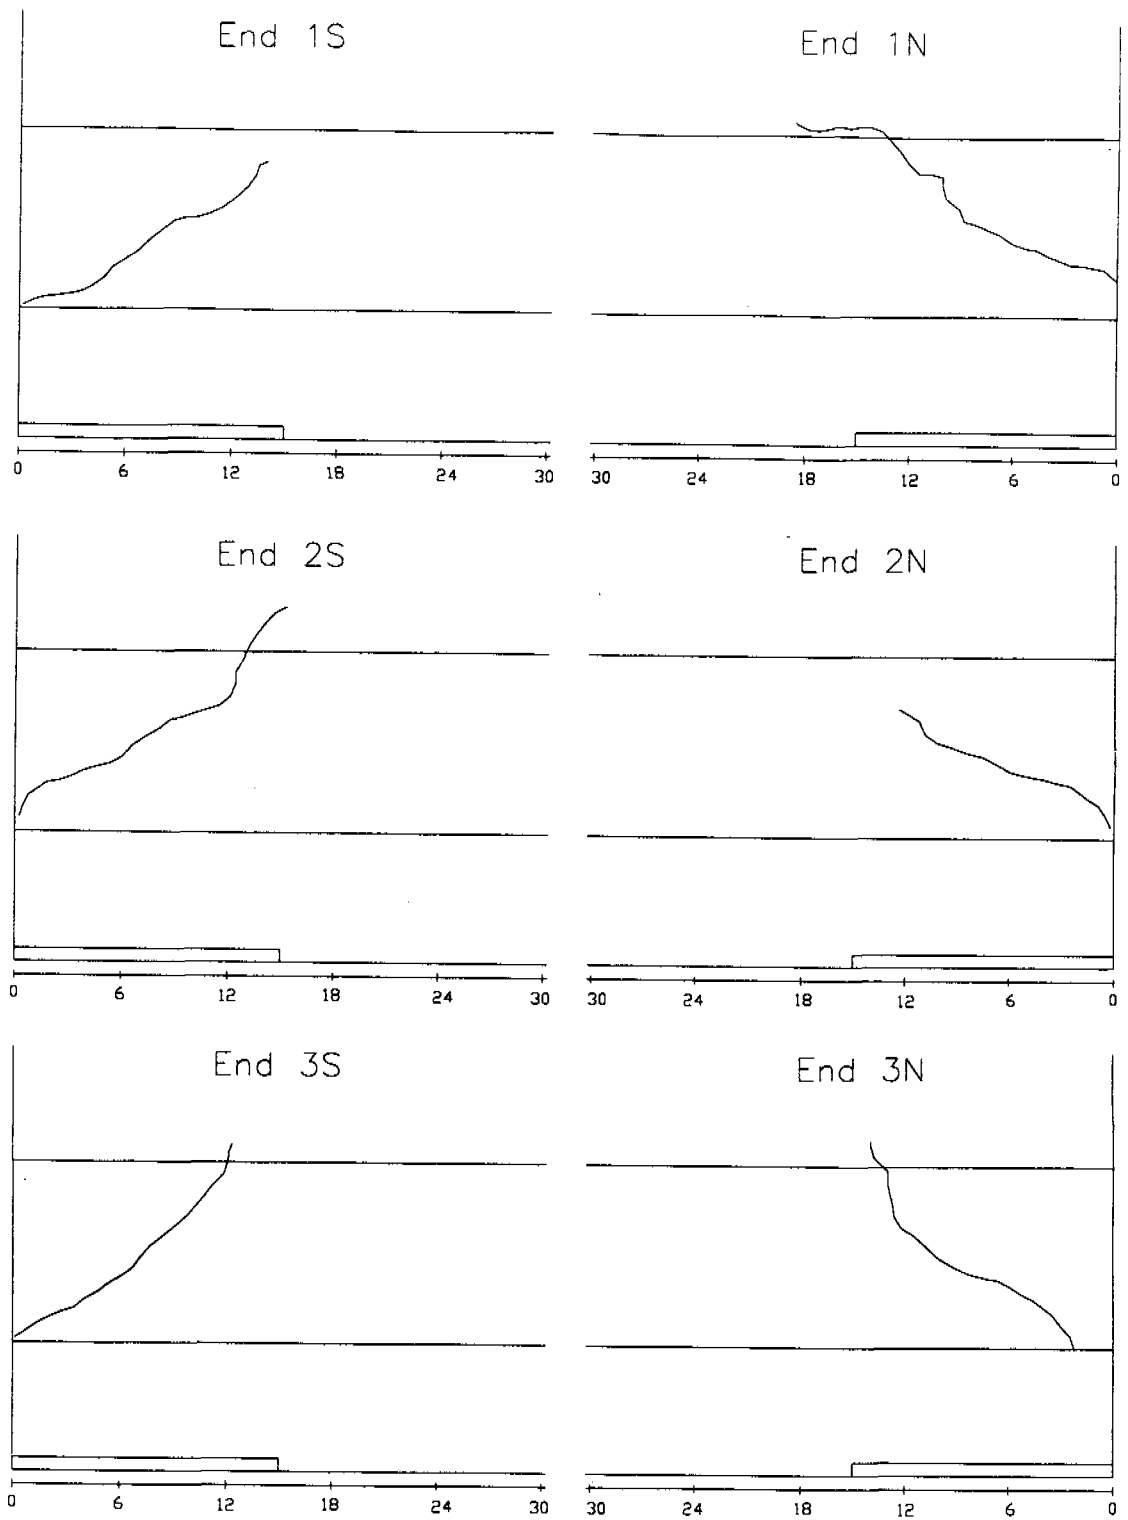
Survey Form for 63 in. Girders, 8-3-95
